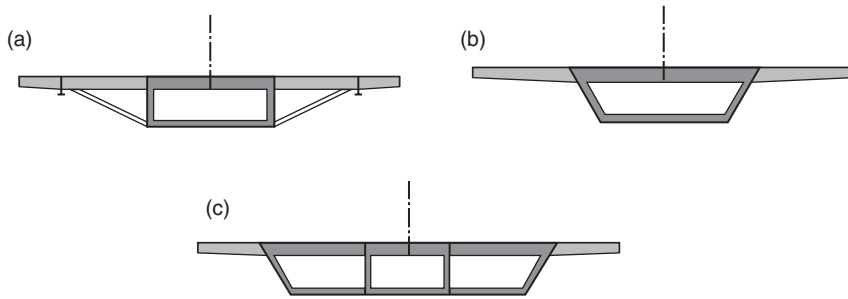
shows three basic cross sections to be found in cable stayed bridges with a central cable plane.
